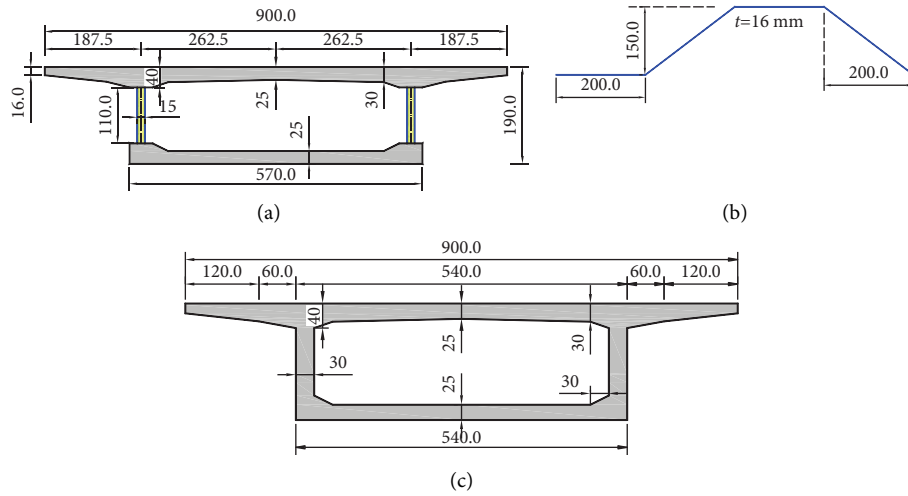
Cross-sectional diagram of the box girder: (a) section of the composite box girder with corrugated steel webs (cm), (b) detail of the corrugated steel web (mm), and (c) reinforced concrete box girder section (cm).
